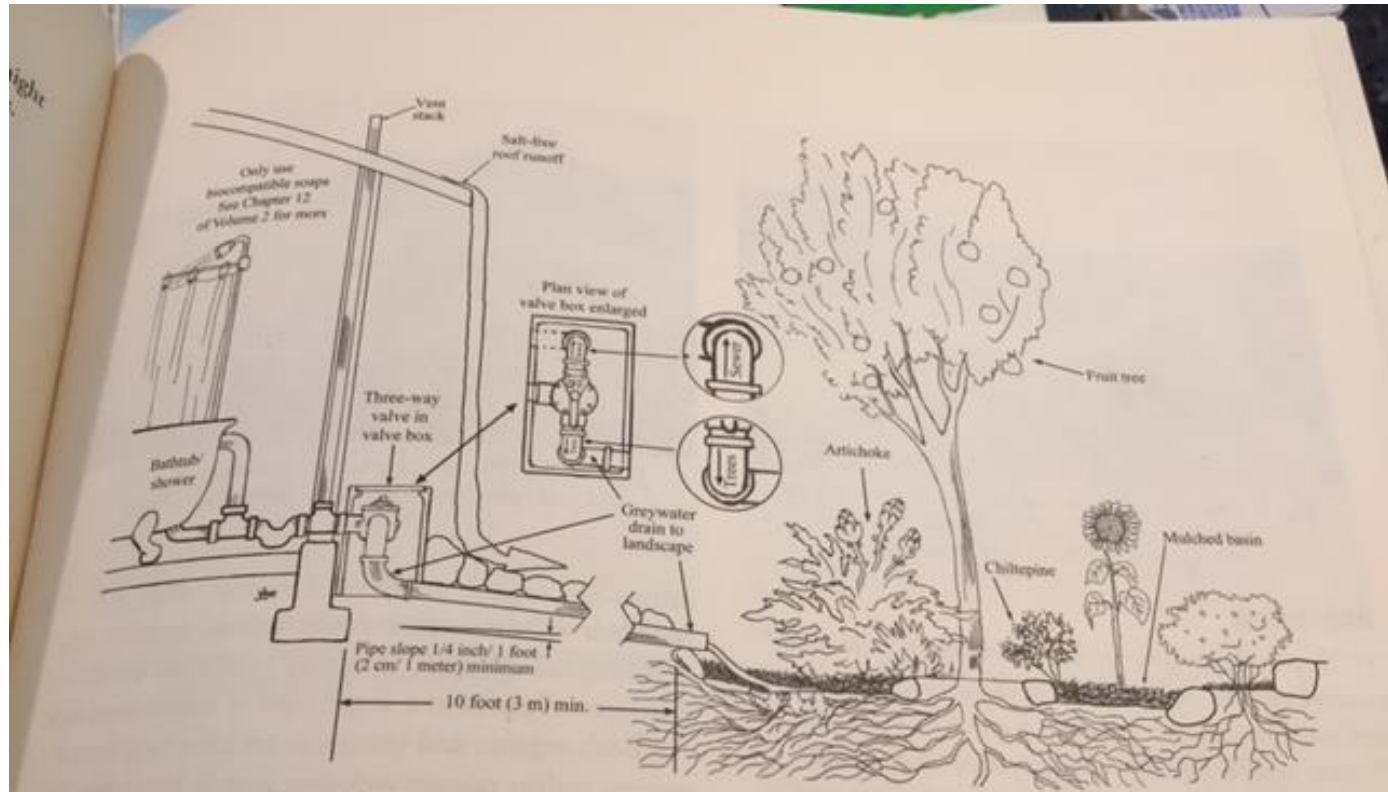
A. Roof runoff and bathtub/shower greywater directed to a well-mulched and vegetated infiltration basin. Note P-trap and vent stack between interior drain and exterior greywater outlet, which prevents potential odor and insect entry into house. A three-way valve (downstream of the P-trap and vent) in a valve box allows for distribution of greywater to either the landscape or sewer (compare to fig. 3.12B). End of greywater pipe discharges a few inches (7.5 cm) above the mulch in the basin to prevent roots growing into pipe and solids from backing up and clogging pipe. Greywater immediately infiltrates beneath the surface of the mulch to be used by plants.
